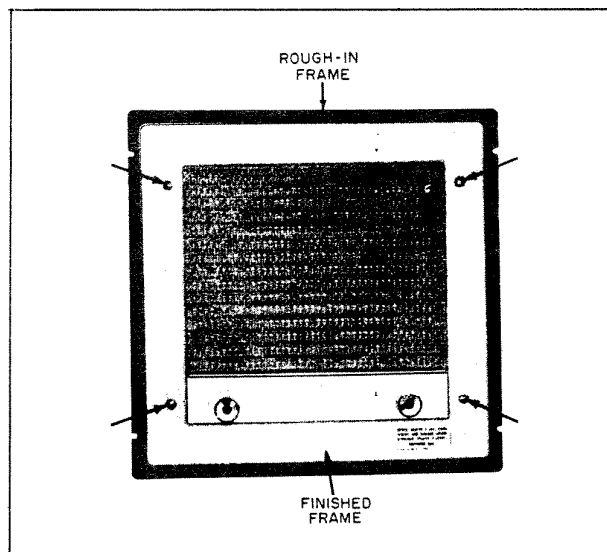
Finished frame assembly of outside-installed Model 2020 remote speaker station.
